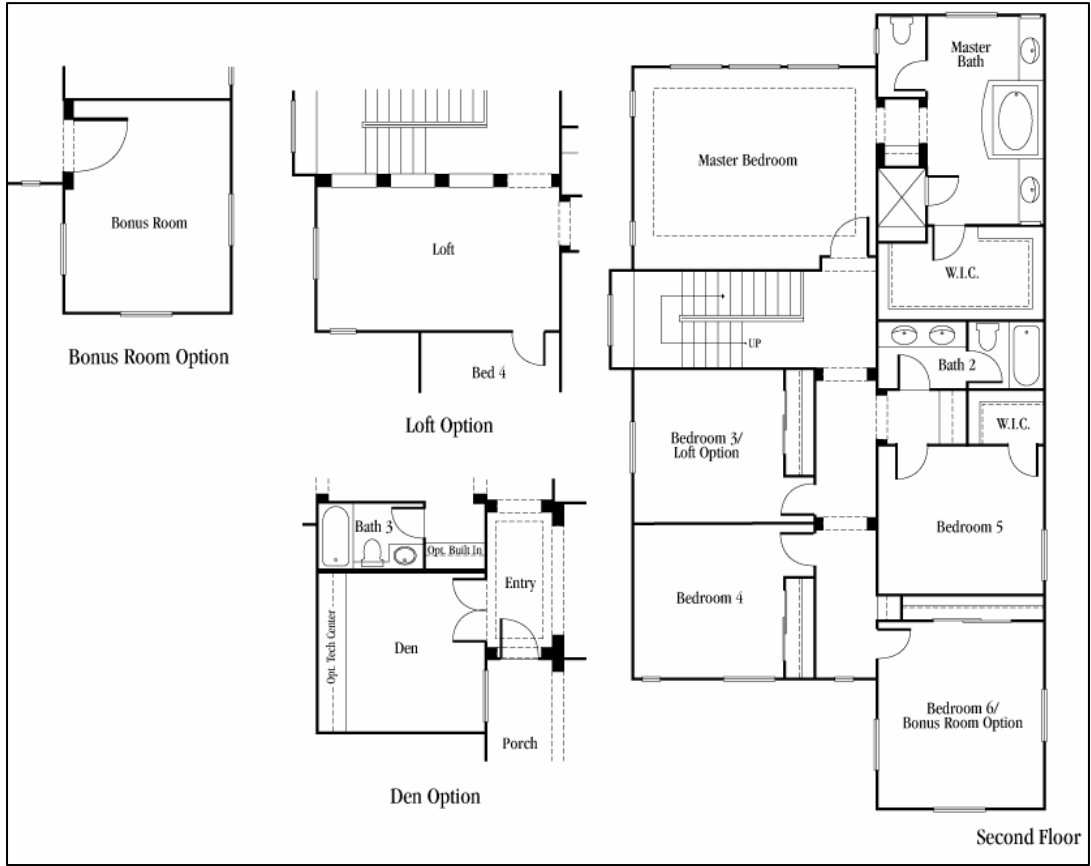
Plan 5A Second Floor Plan, Optional Den, Loft, and Bonus Room
